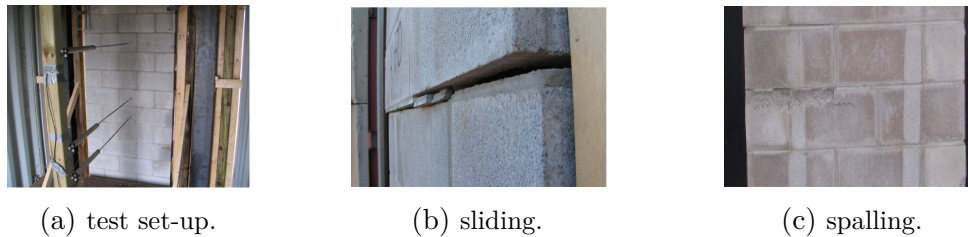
Structural failure modes of one-way arching masonry wall subjected to blast loads. Credit: [Abou-Zeid et al. \(2011\)](#).
